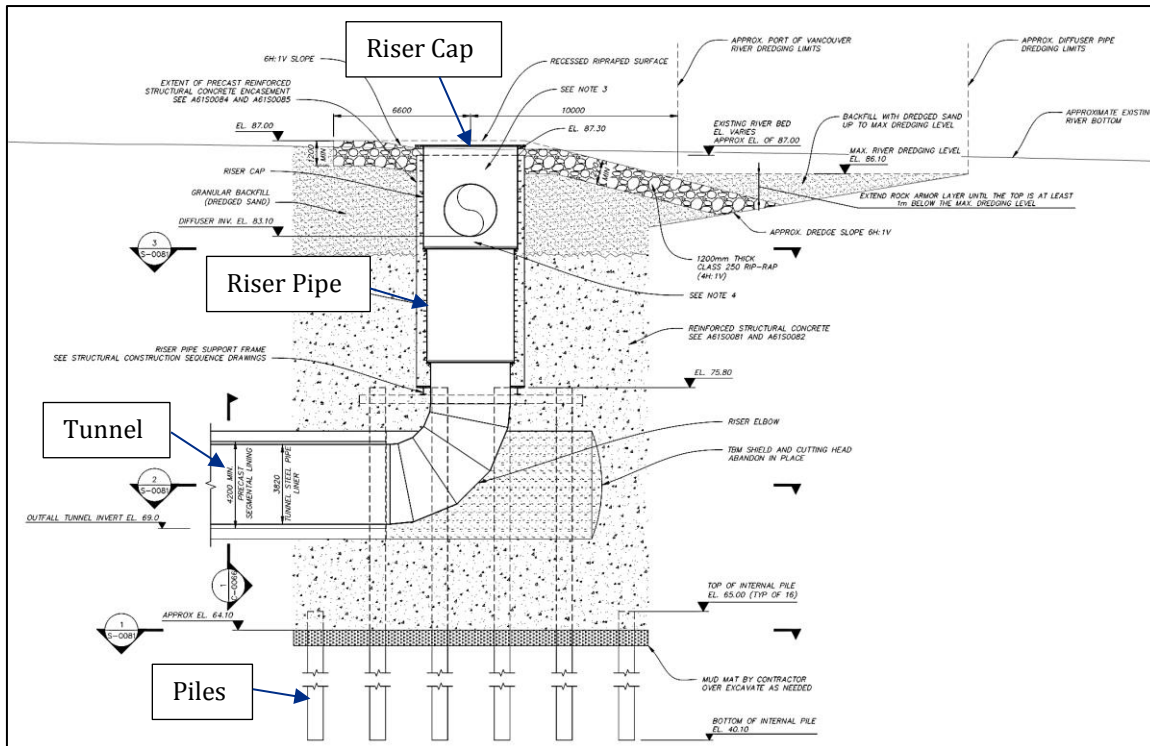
Outfall Tunnel Steel Liner at River Riser (Drawing Number A61C0004)
